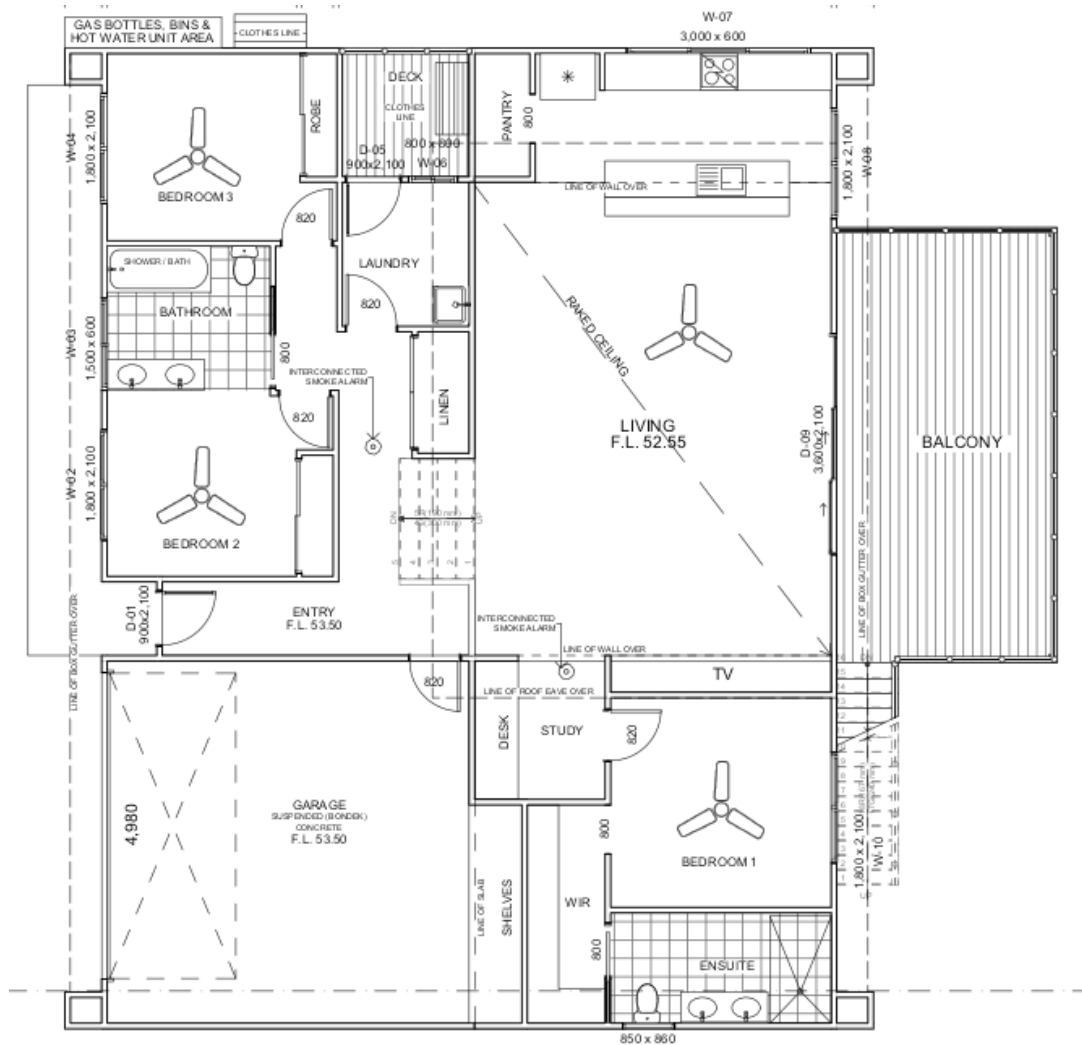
PROPOSED FLOOR PLANS (JD PARVIN DRAFTING)
